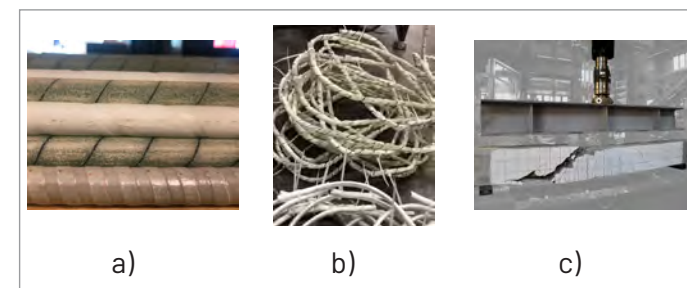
a) FRP bars with different surface finishes, b) bent thermoset and thermoplastic GFRP bars, and c) failure mode of a GFRP-reinforced concrete beam.
